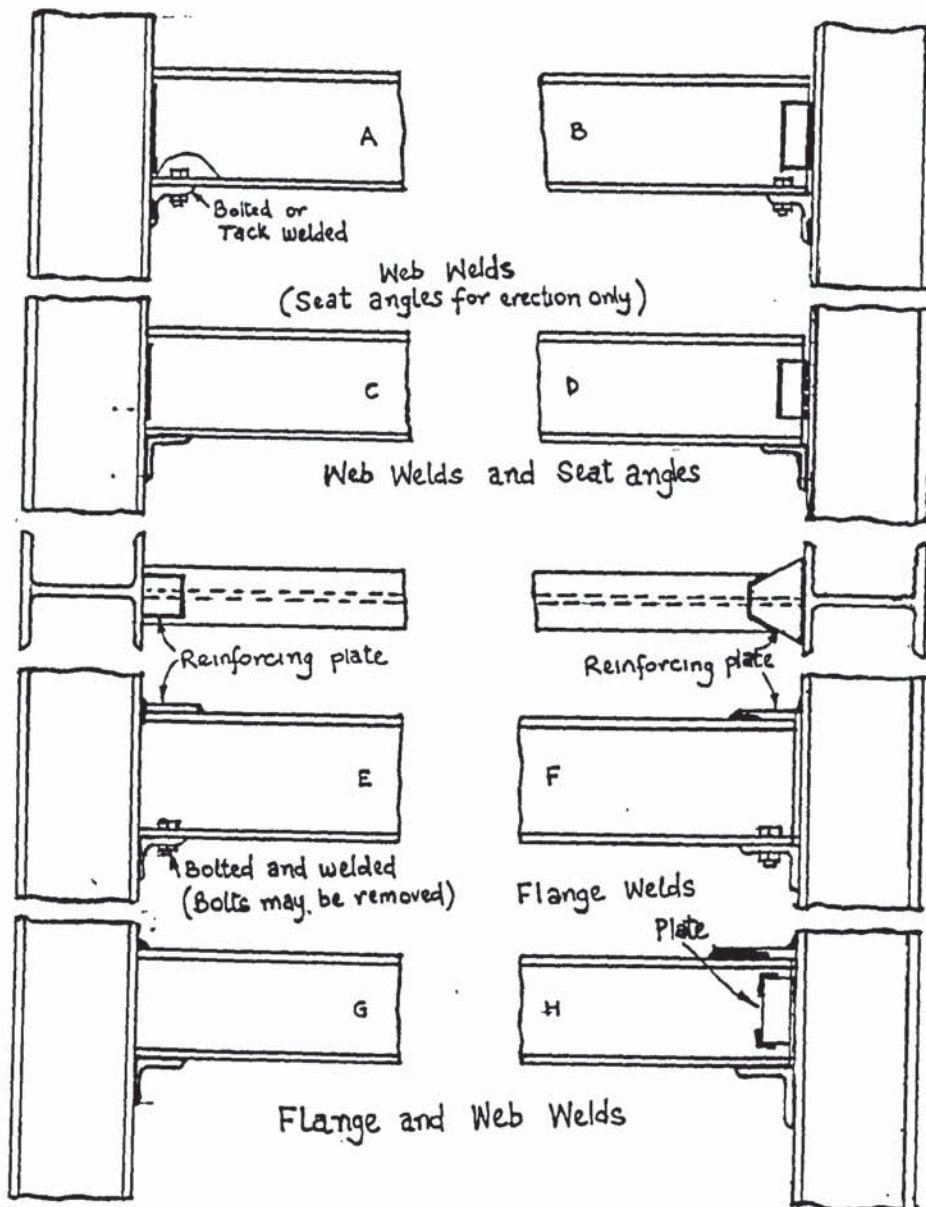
Uhler and Jonsen's Beam-to-column connection
